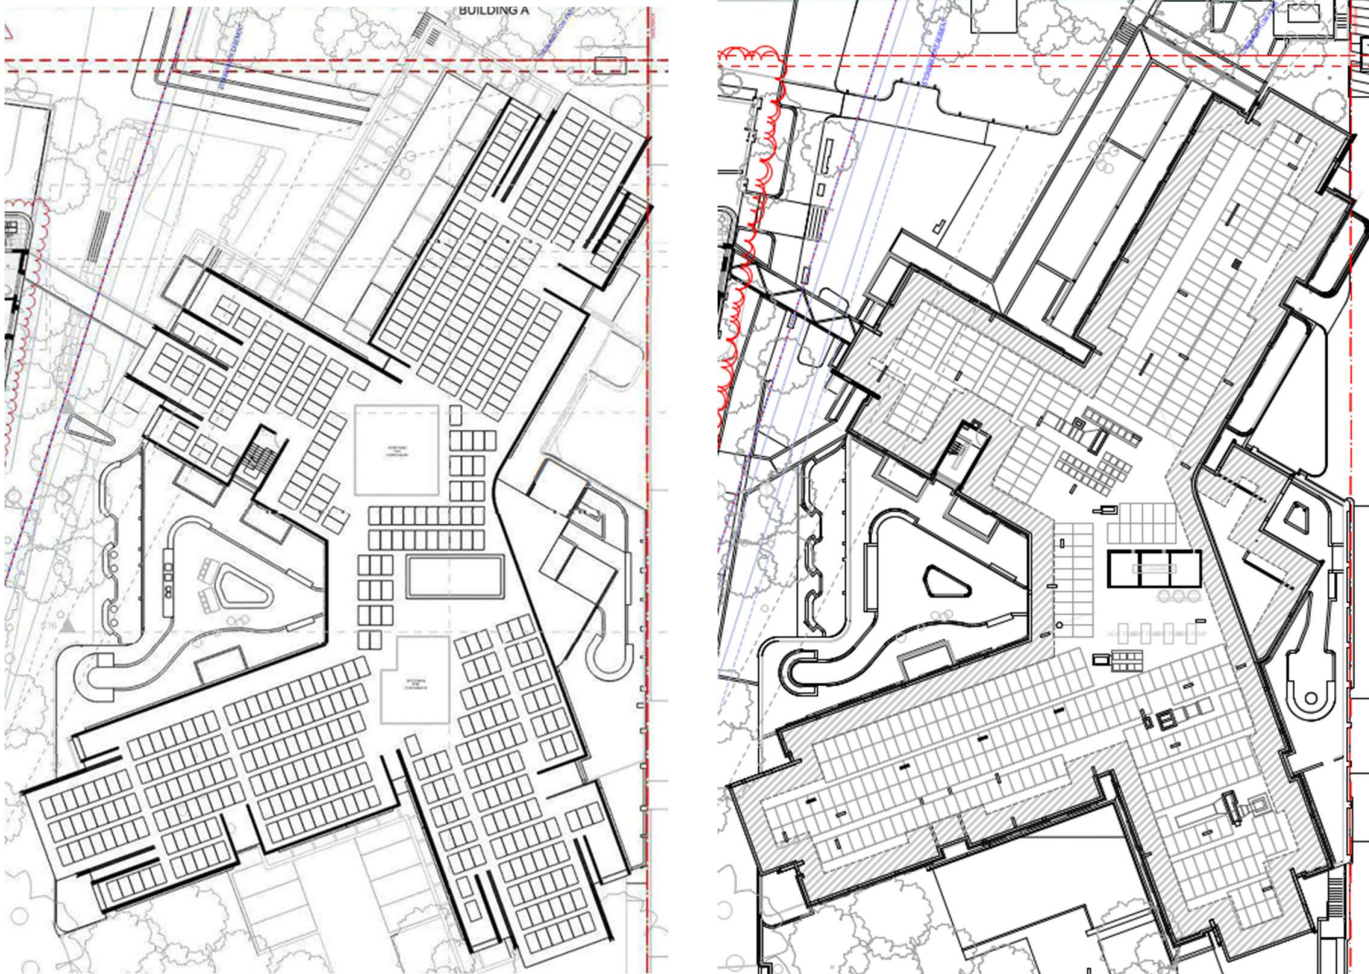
Approved and Proposed Level 04 of Building A (2 of 2)
